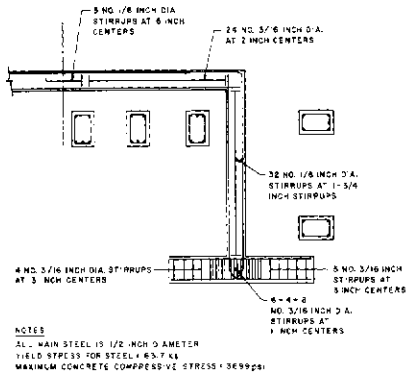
Reinforcement details for Frame FP4 (after Cranston and Cracknell [1]).
